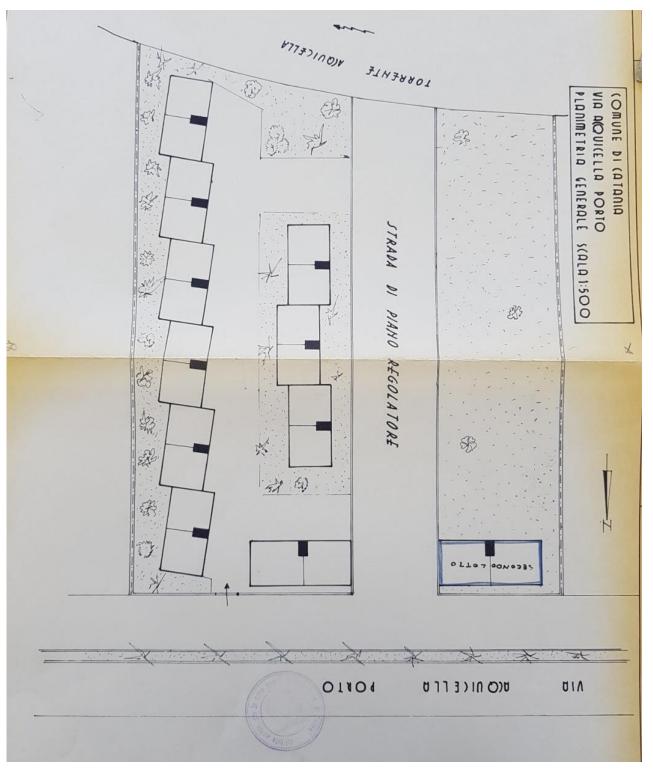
Map of the final project unless the town plan road not yet built. The blue perimeter indicates the pilot building.
